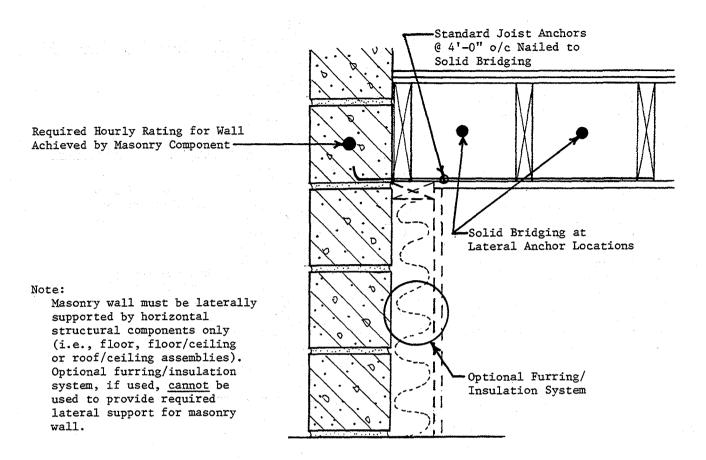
Single Wythe Masonry Wall (Non-Bearing Condition)
